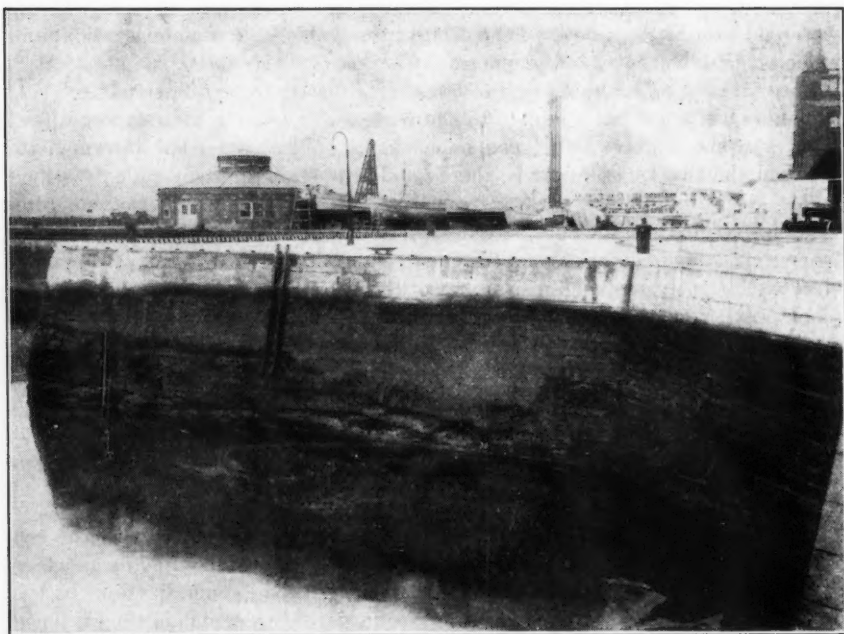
QUAY WALL D, PUGET SOUND NAVY YARD, BREMERTON, WASH.
